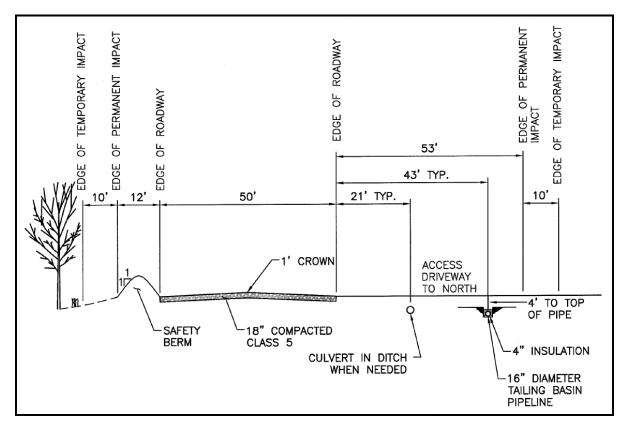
C Typical Road/Pipeline Cross Section – Low Areas
